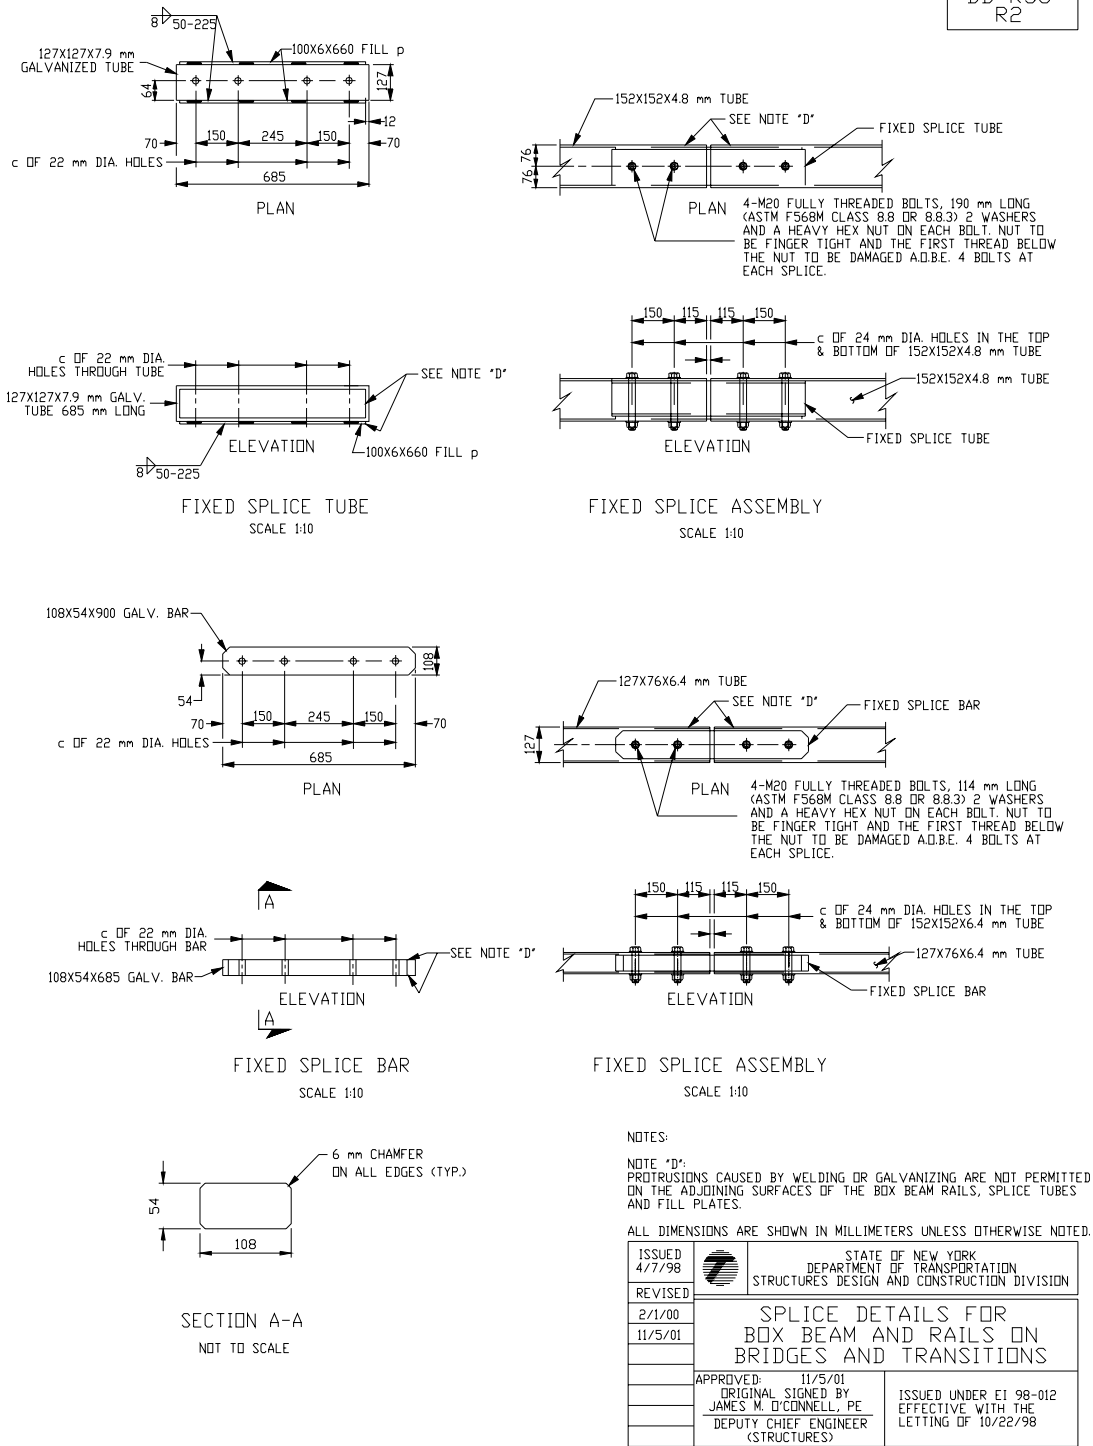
Details of the NYSDOT box-beam transition—fixed splice details.
